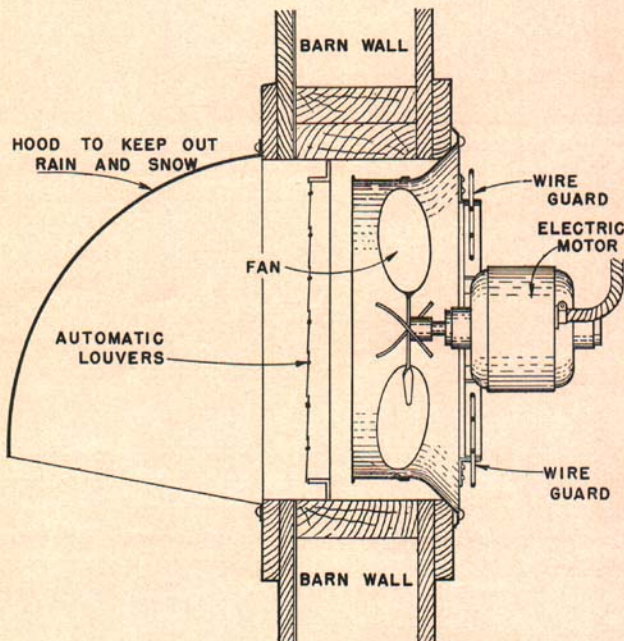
Detail of a mechanical ventilating fan. The diagram shows how the hood on the outside of the barn protects the exhaust fan from snow and rain.
